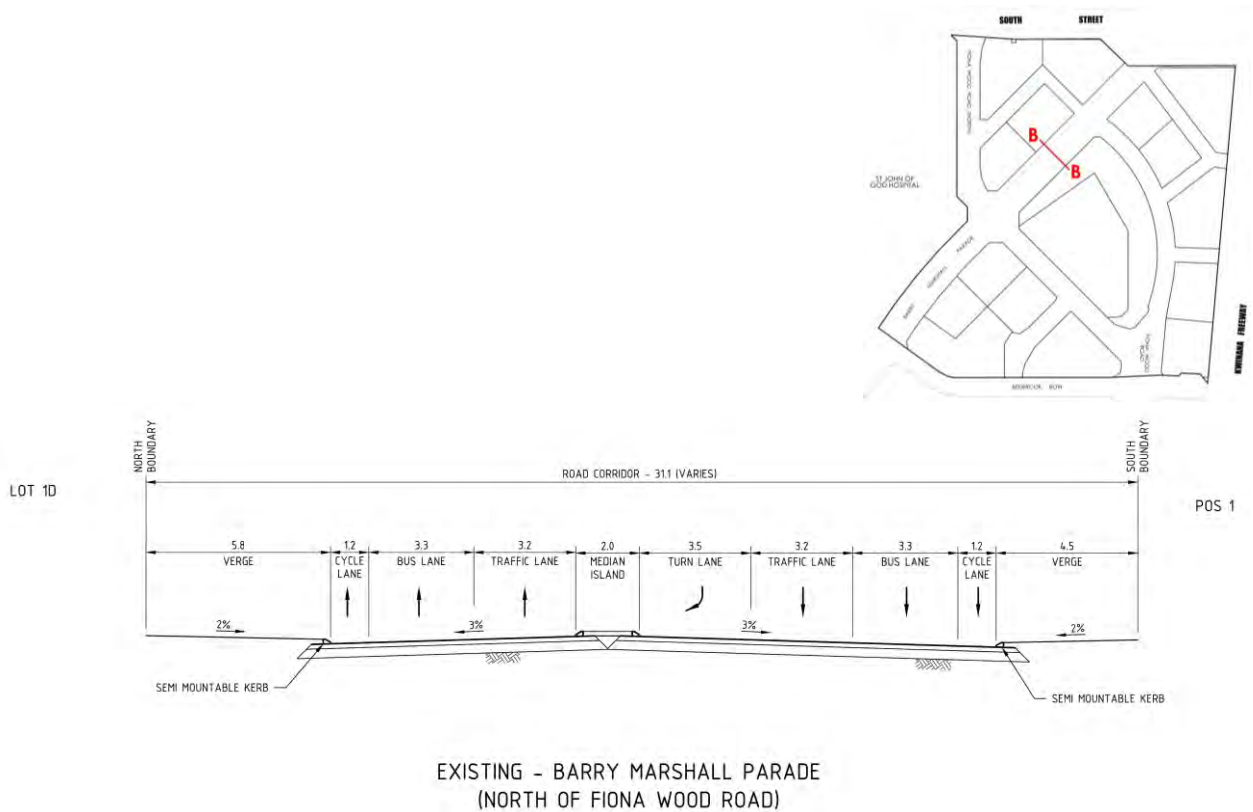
Section B-B Barry Marshall Parade (North of Fiona Wood Road)
